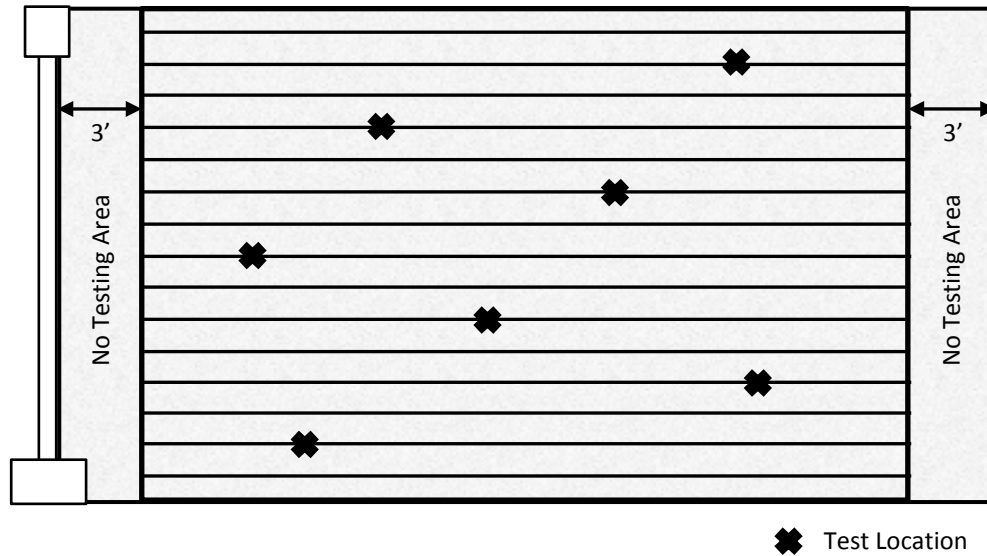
Testing Frequencies and Locations for MSE Walls (less than 100')
